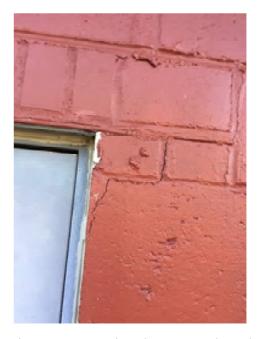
Masonry cracking adjacent exterior door on building's East Elevation. Tuckpoint exterior. (Priority 0).
